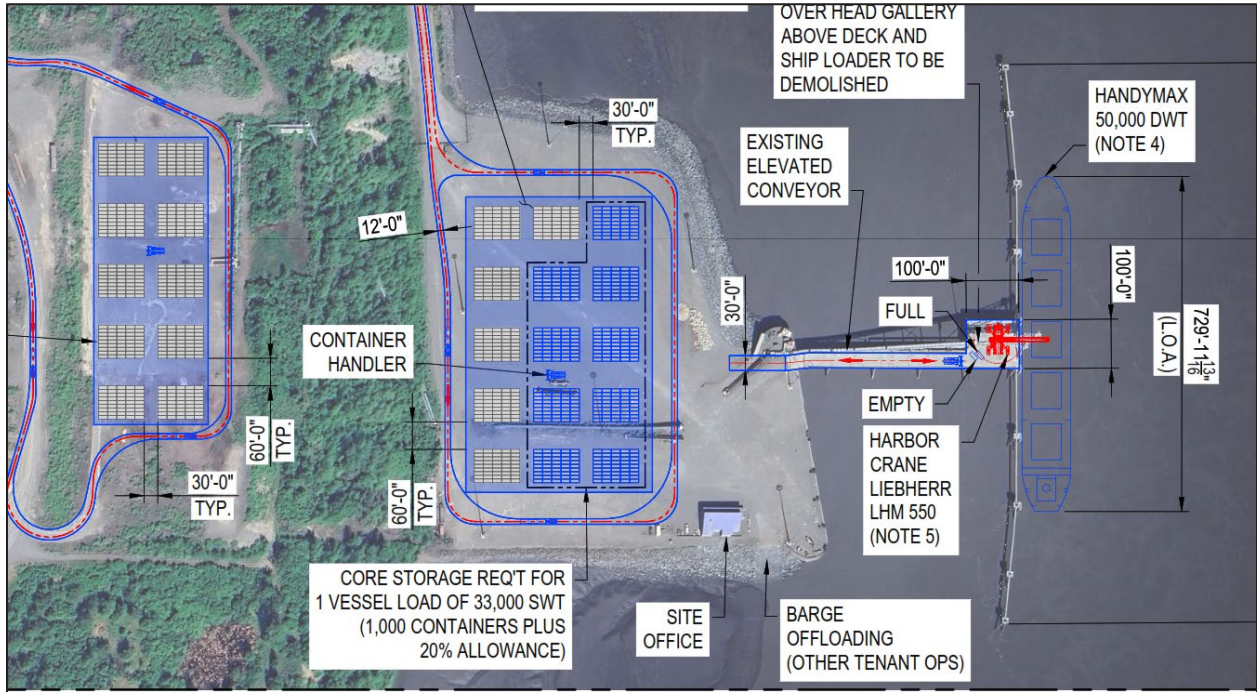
Port MacKenzie Proposed Site Plan: Primary Storage Area and Dock Detail
